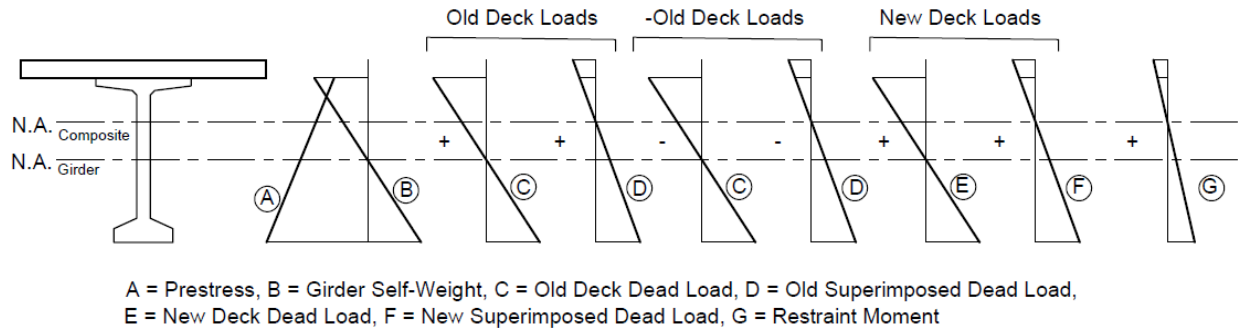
Typical Stress Distribution in a Prestressed Concrete Girder Bridge with Deck Replacement
